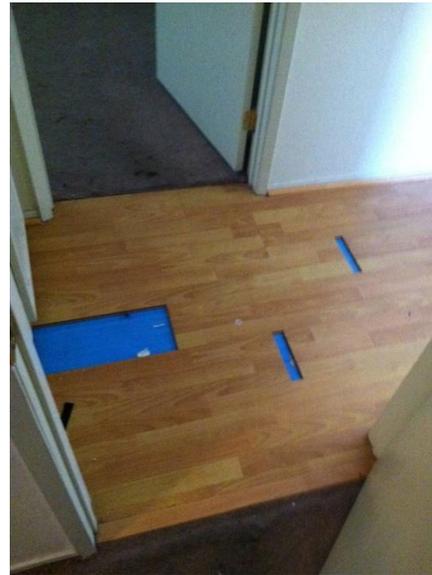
Damaged flooring in Unit 7 (similar, although less pronounced, conditions exist in other units)
